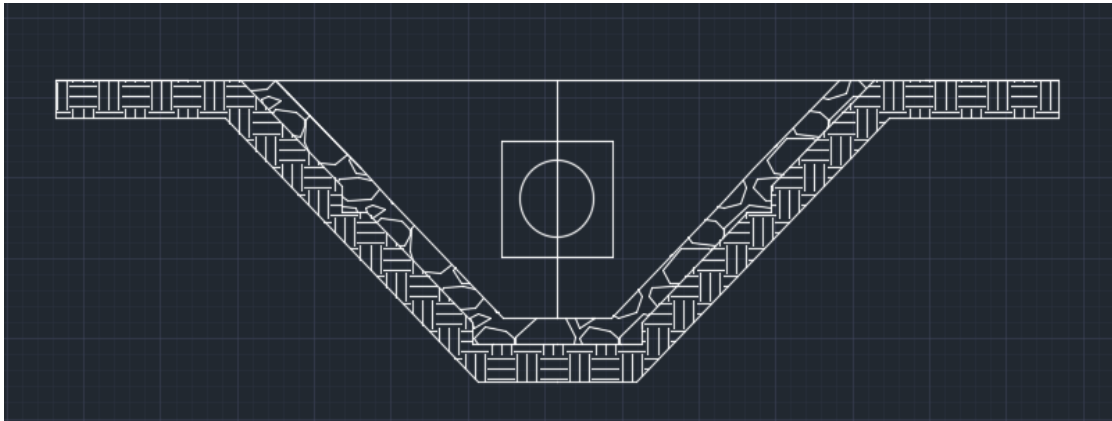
Autocad rendering of channel cross section with 1:1 side slope.
